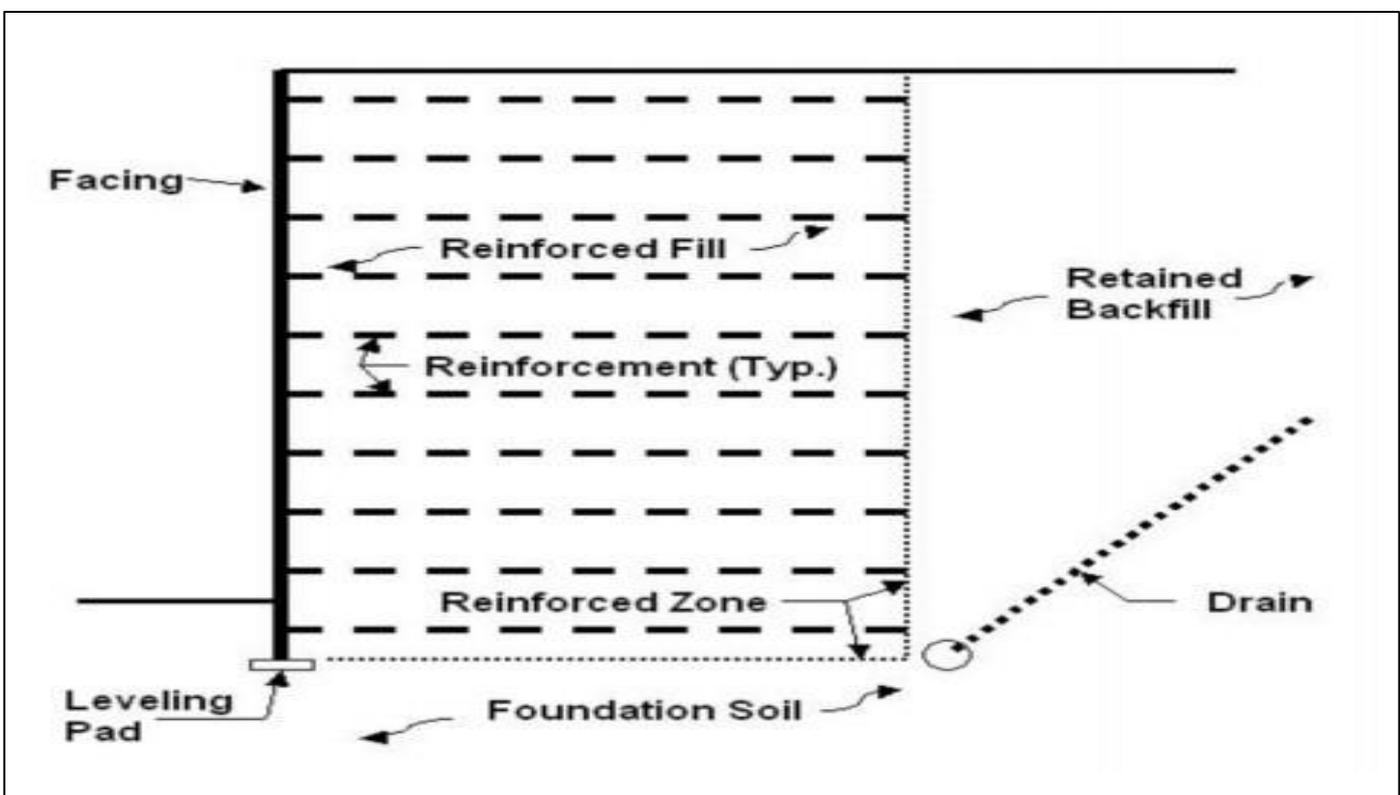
Element of Mechanical Stabilized Earth Walls (Bailleul Guillaume Laga Matthias (2017))
